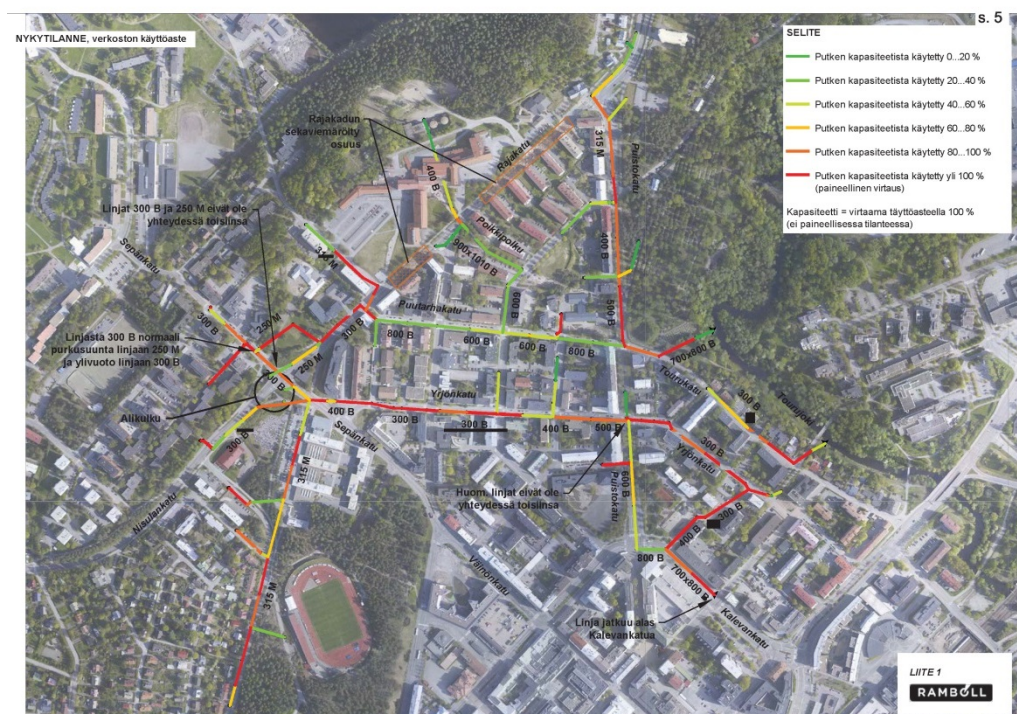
Existing storm water system. (Storm water management plan for street Rajakatu 2012).
